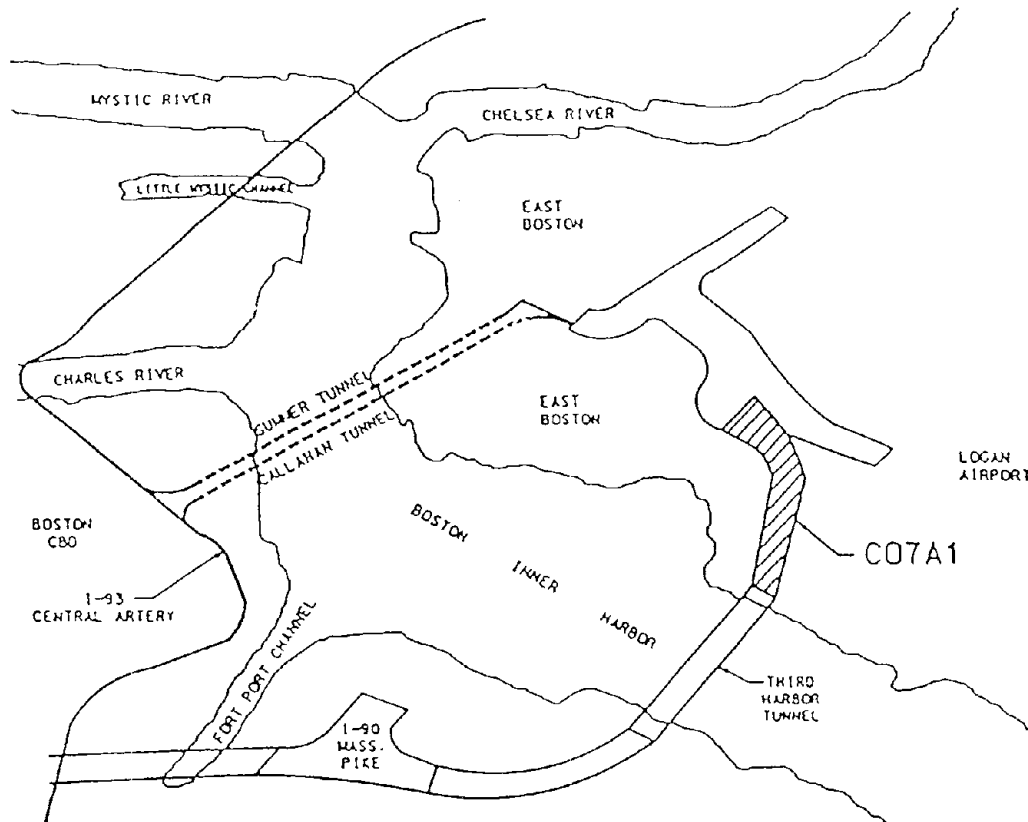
Site plan for deep mix wall - Boston Central Artery.
